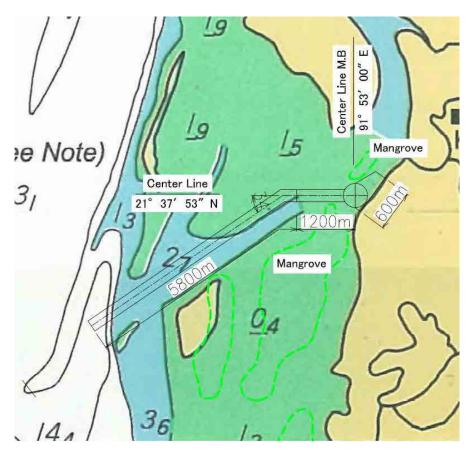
Layout Planning B (North Maheshkhali Site)
